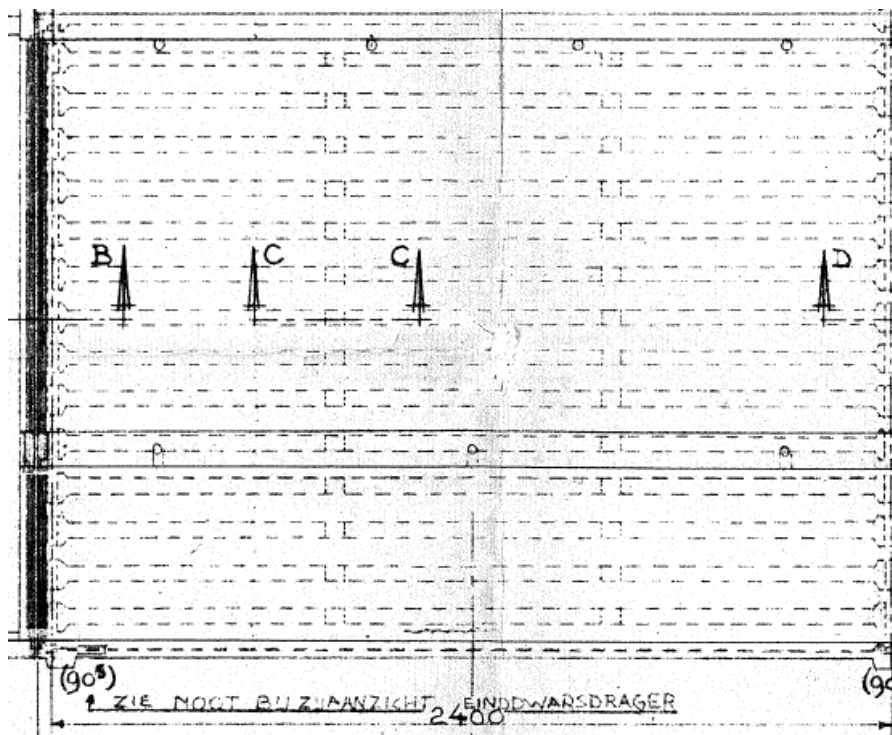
considered field of bridge, 24 m, with cross beams at 8 and 16 m, and end beams 0.15 m from the ends.
